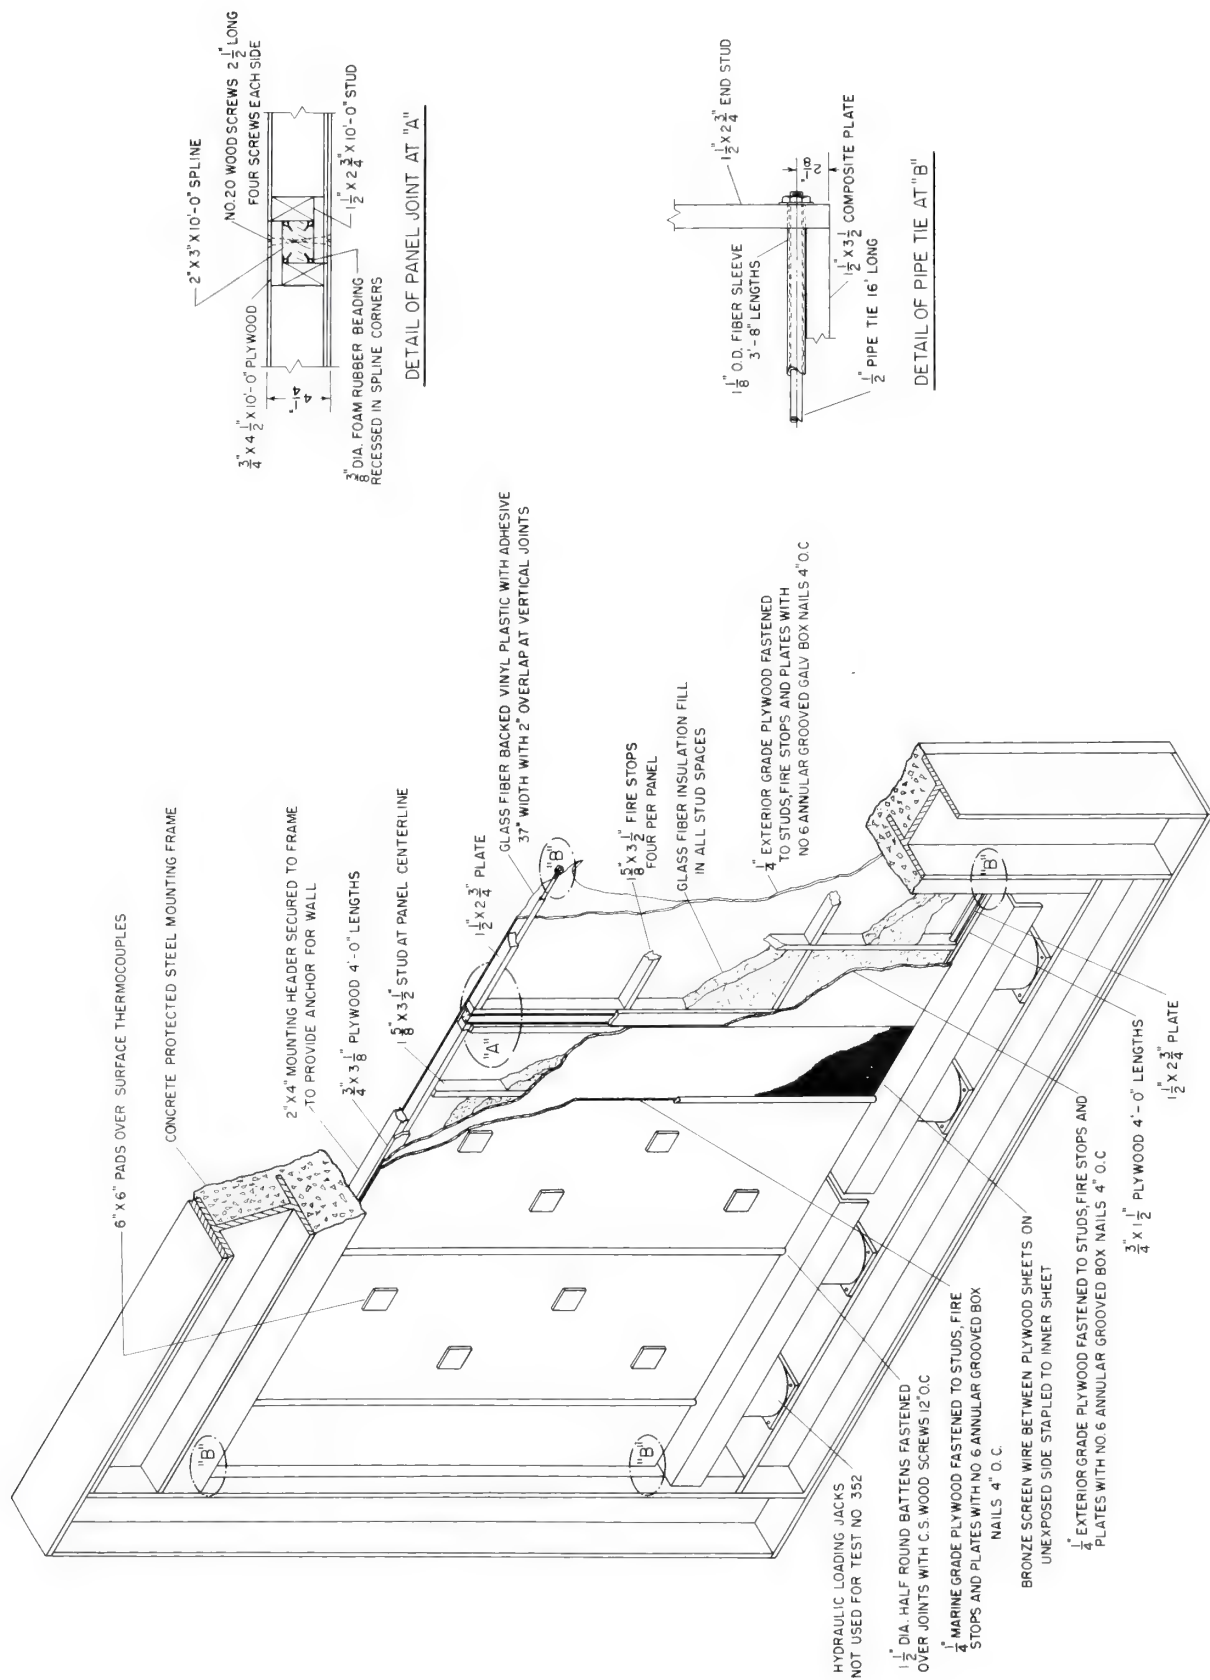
CONSTRUCTION AND MOUNTING DETAILS OF PREFABRICATED WOODEN EXTERIOR WALL
